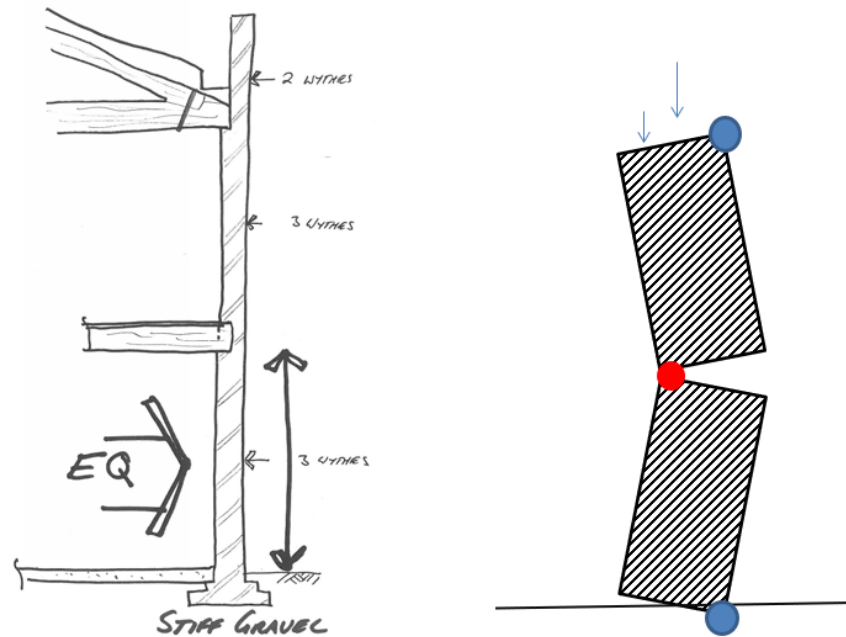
B.26: Boundary conditions for lower wall with upper wall and parapet above, stiff ground
